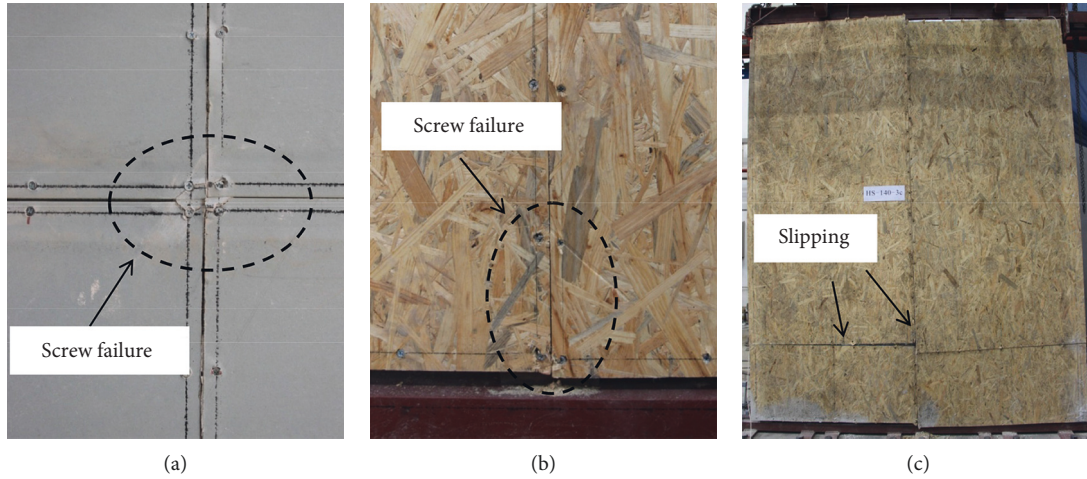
Typical failure modes of CFS shear walls: (a) failure in gypsum-CFS connections, (b) failure in OSB-CFS connections, and (c) relative slips at board seams.
